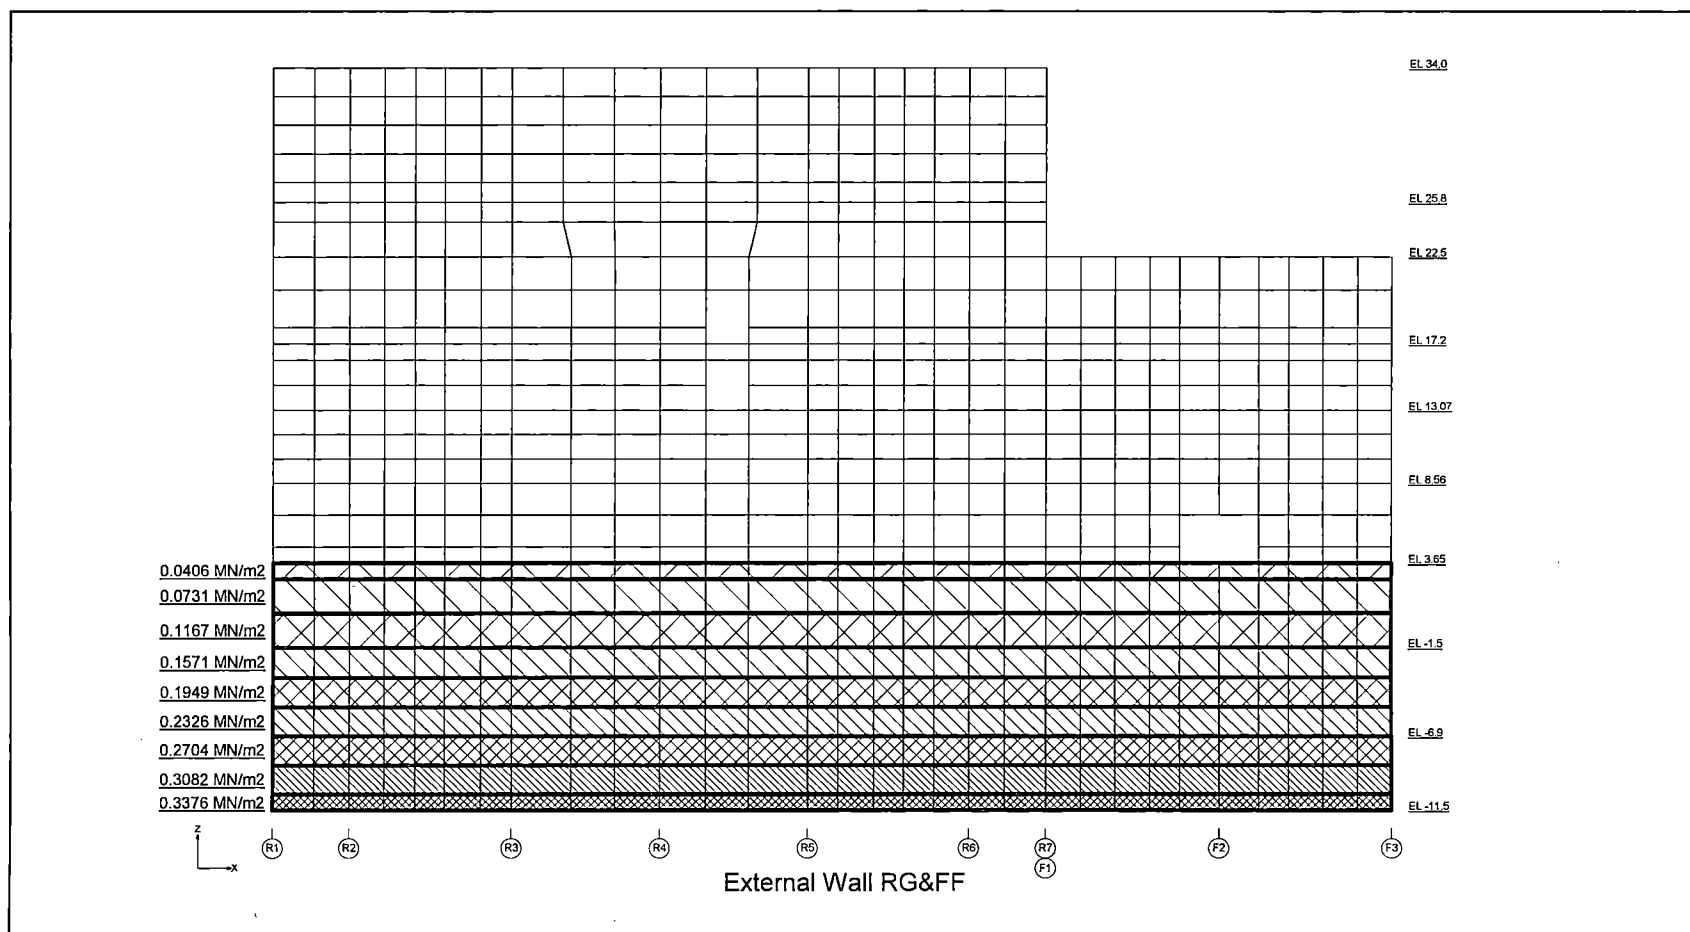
Lateral Soil Pressure Load at Rest (RG/FF External Wall)
